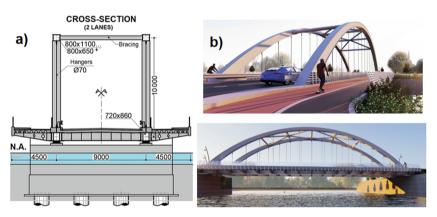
Bridge with two carriage-lanes: a) Cross-section; b) Rendering.
